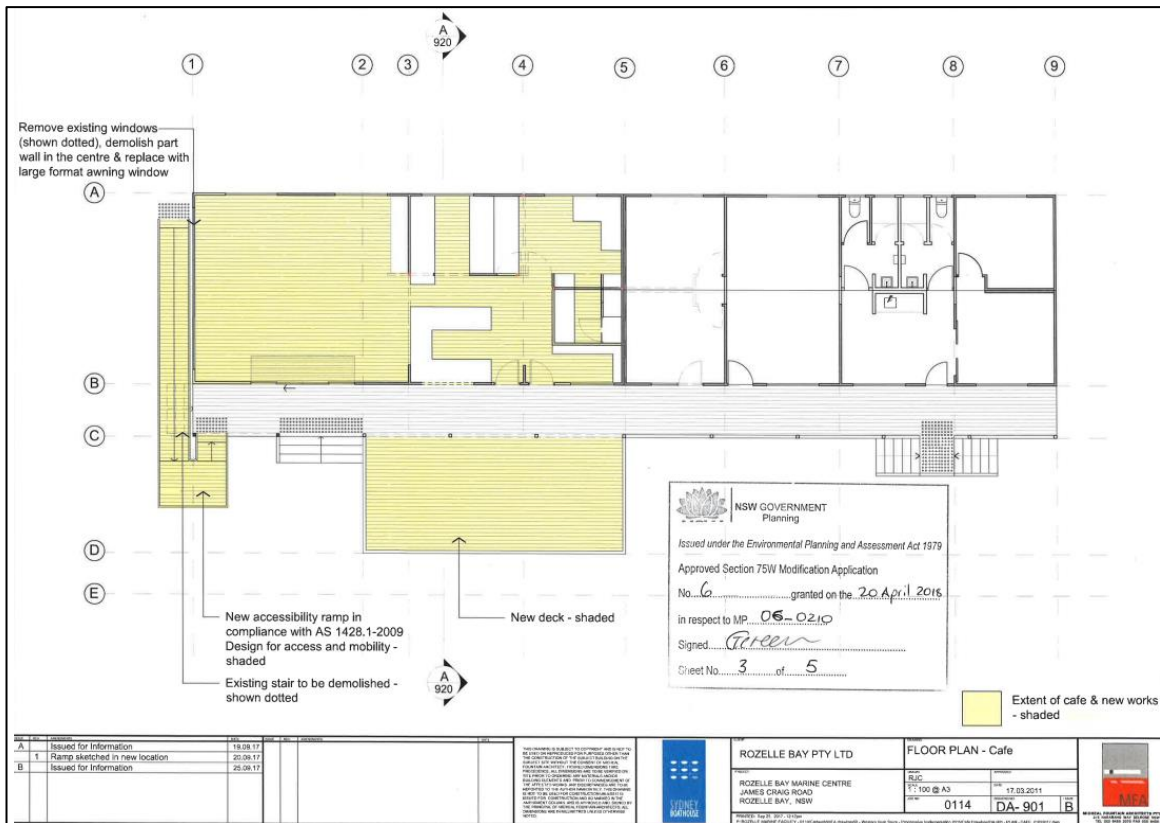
| Detailing the updated layout of the building from MOD 8 (Source: Modification Application)
